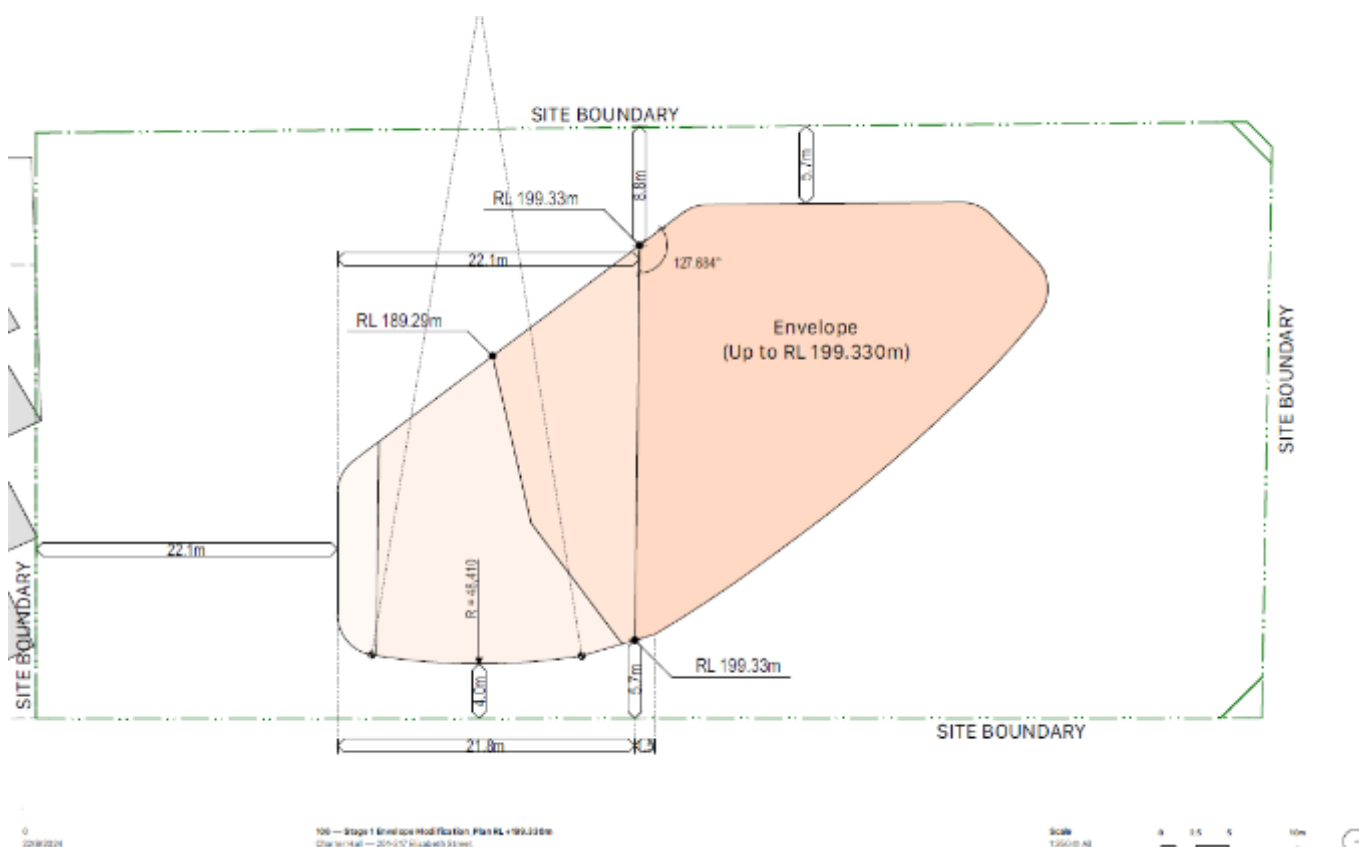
| Proposed high-rise tower envelope (up to RL 199.330) (Source: Ethos Urban modification plans)
